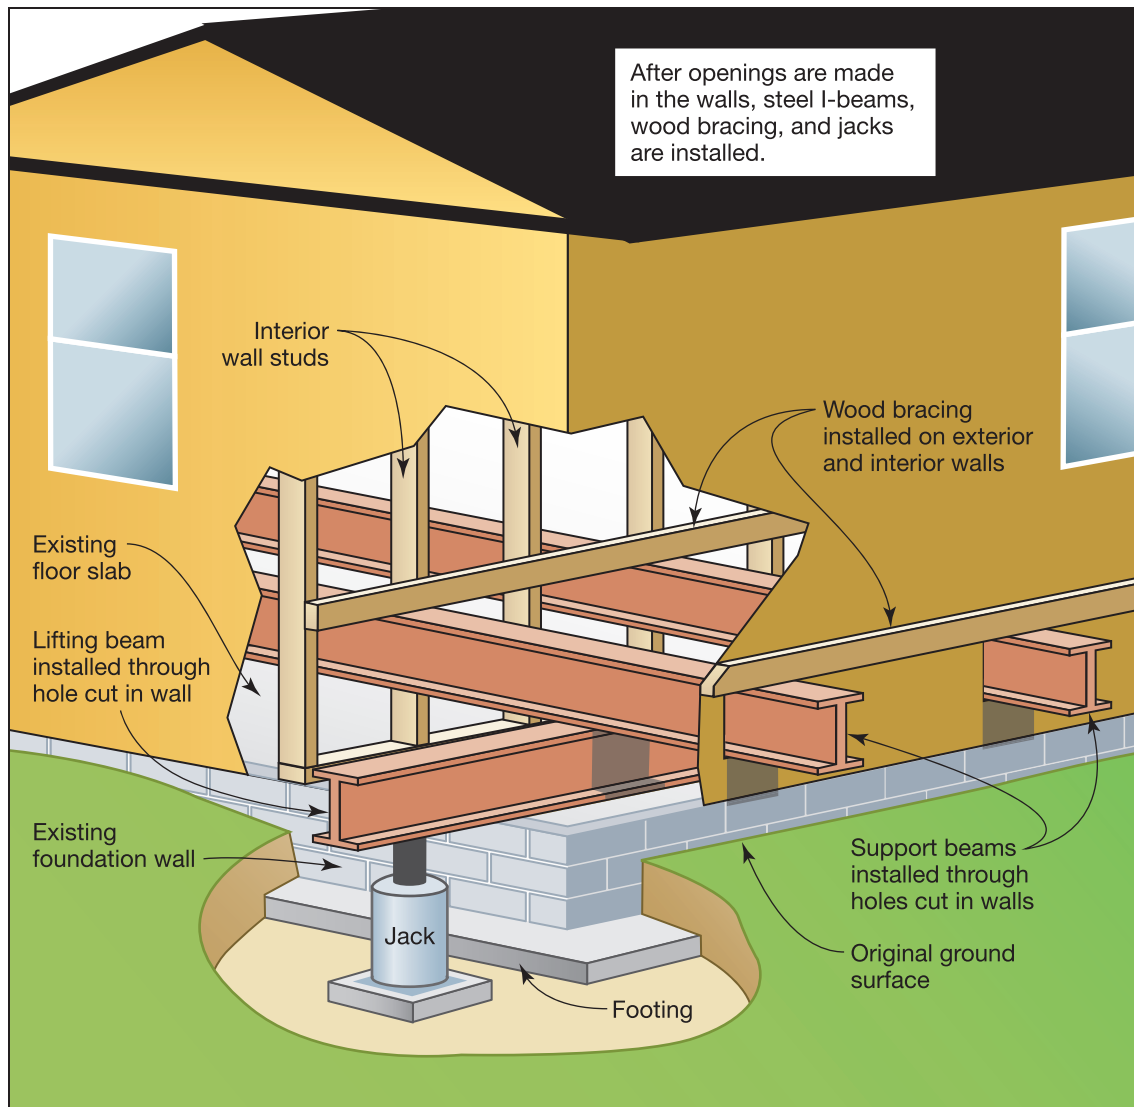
E-17. Step 1 of elevating an existing wood-frame house without the slab using a new first floor constructed of wood trusses: Install steel I-beam network and prepare to lift walls
